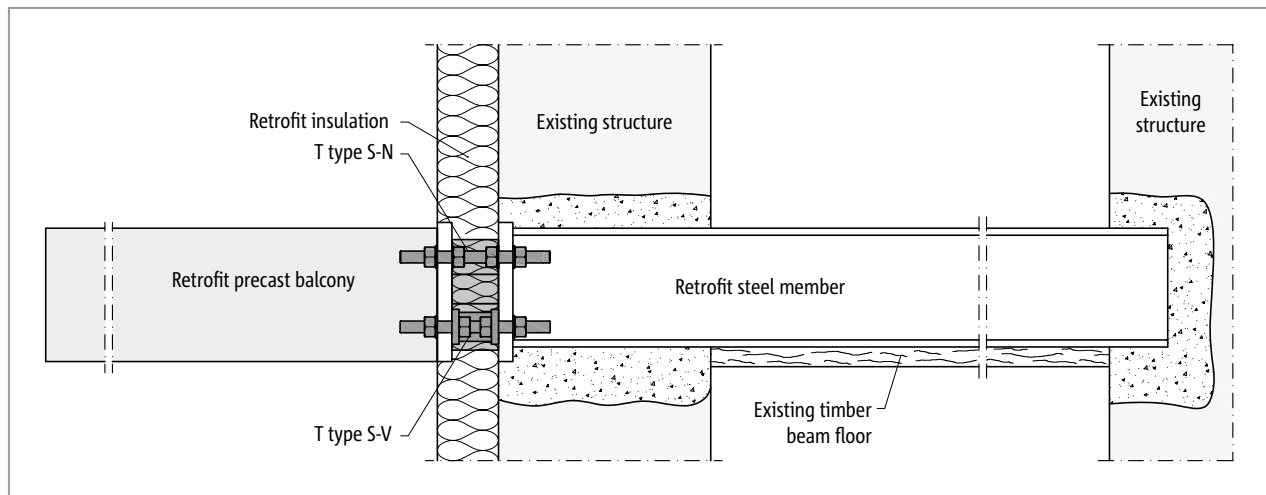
Schöck Isokorb® T type S-N and T type S-V: Retrofitted cantilevered precast balcony connected to retrofitted steel beam
